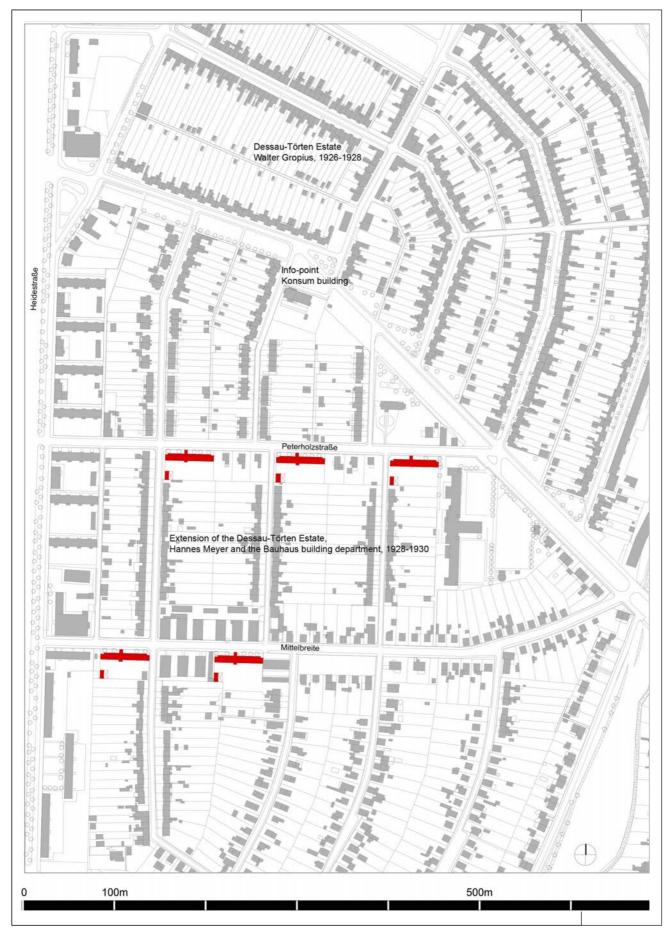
The building department's Houses with Balcony Access, part of the extension of the Dessau-Törten Estate to the north, plan 2015, Bauhaus Dessau Foundation, Brenne Architekten
